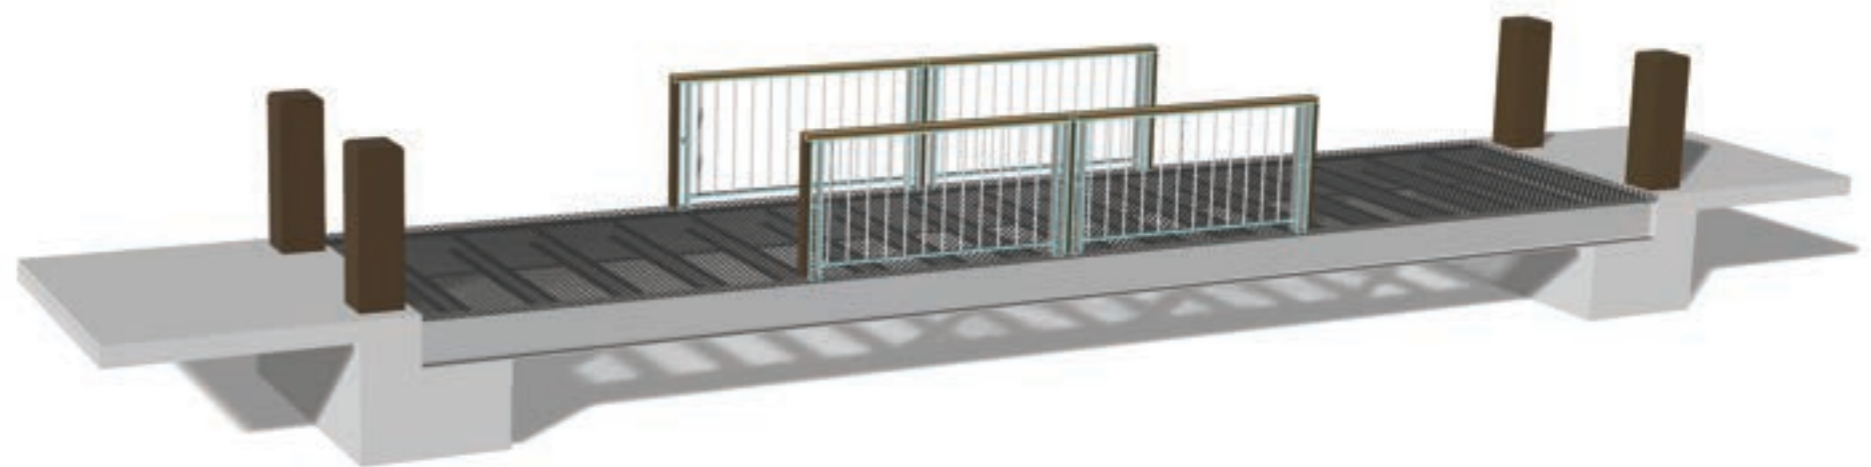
Bridge crossing concept. EF Landscape Architects. 2023.
